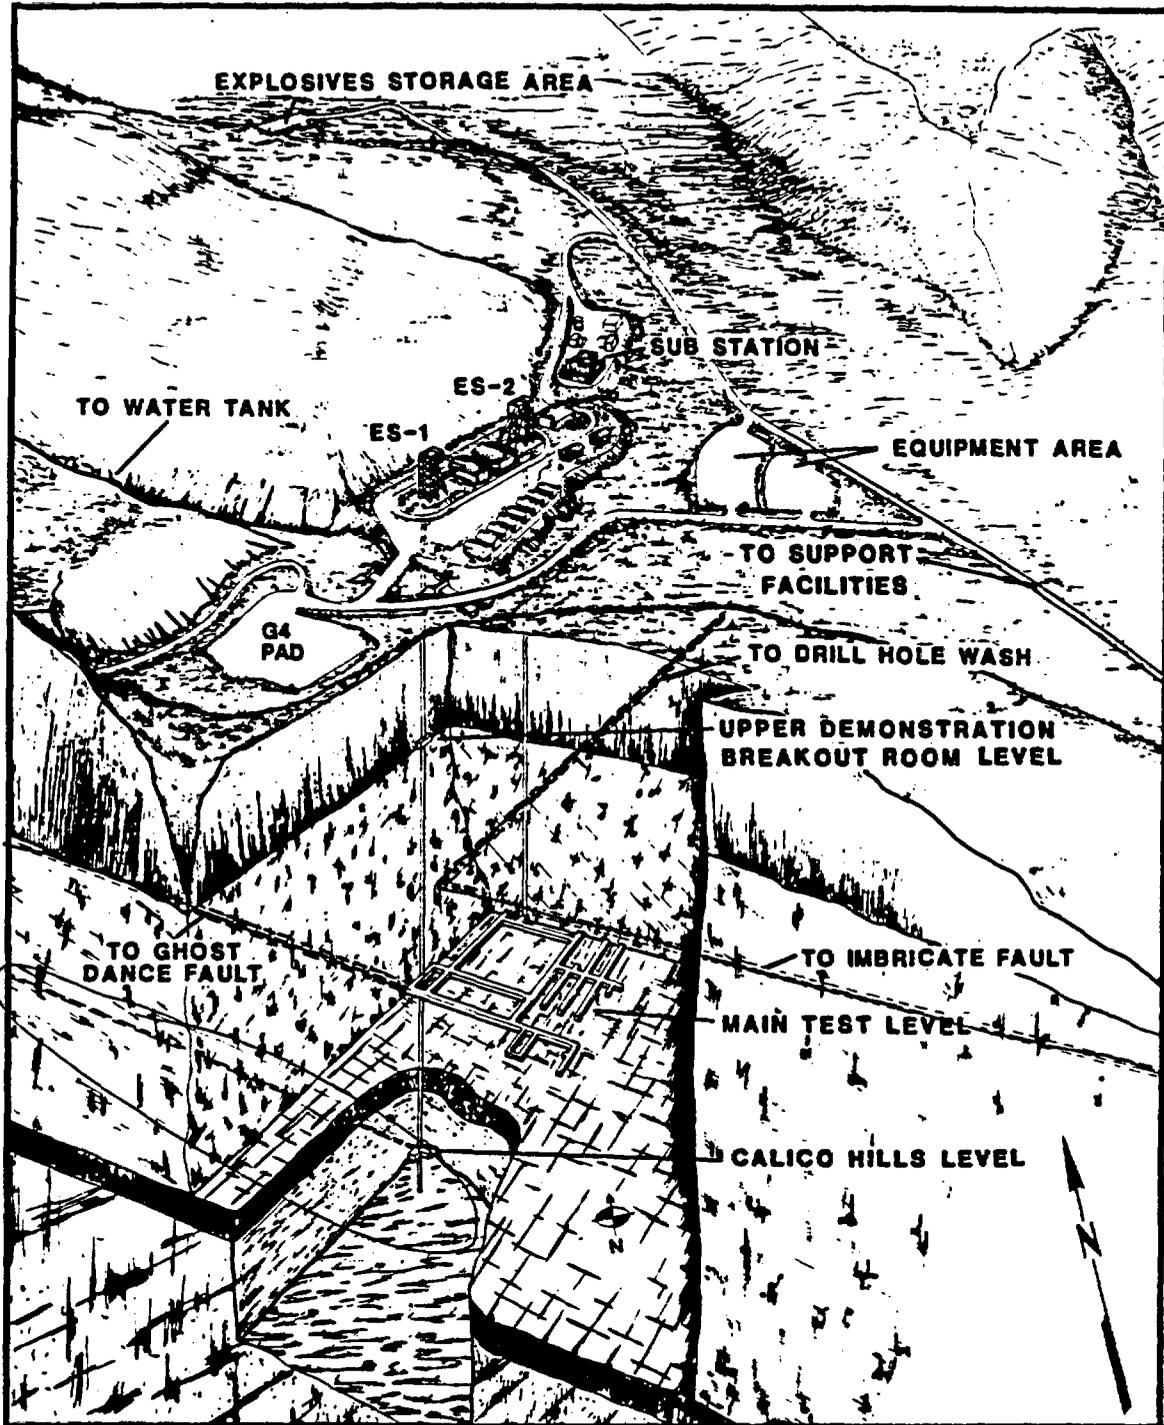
Three Dimensional Illustration of the Exploratory Shaft Facility (Proposed Location).
